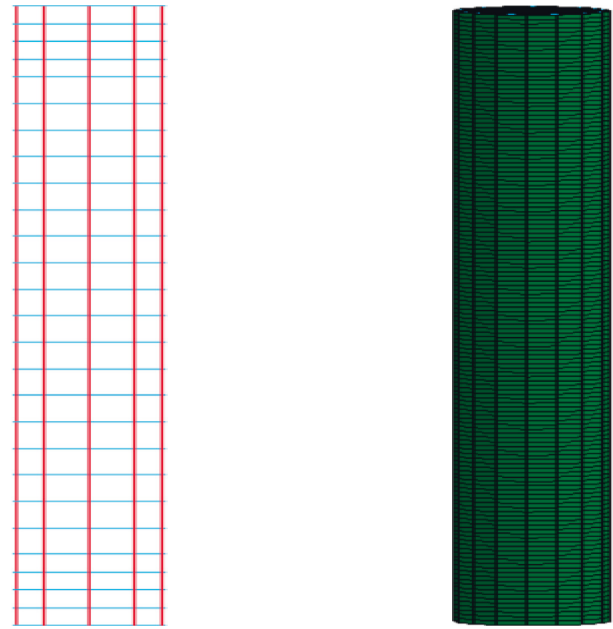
Cross-sectional and reinforcement layout model of a pier in LS-DYNA.
